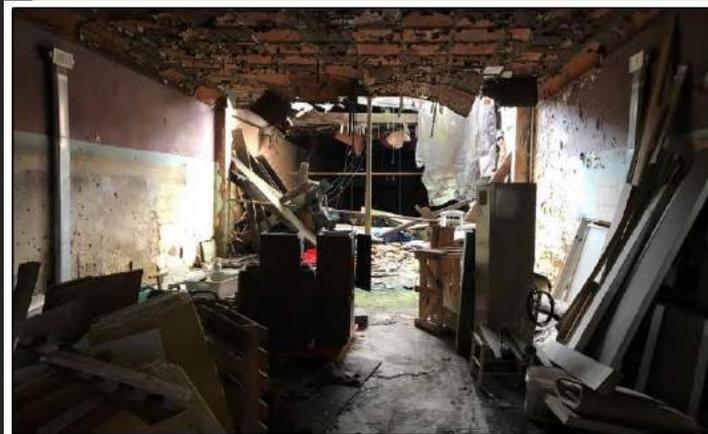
First floor of 606 Main Street parcel, facing south.
